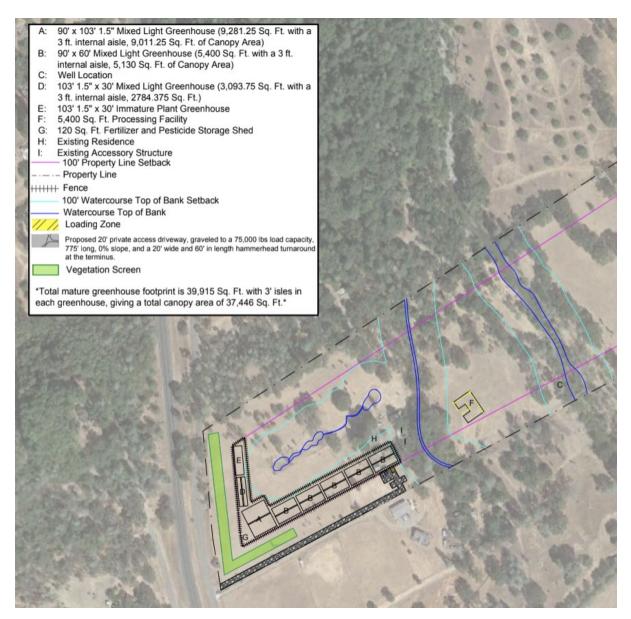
Proposed Project Site Plan (Source: Nina Star Site Plans)
